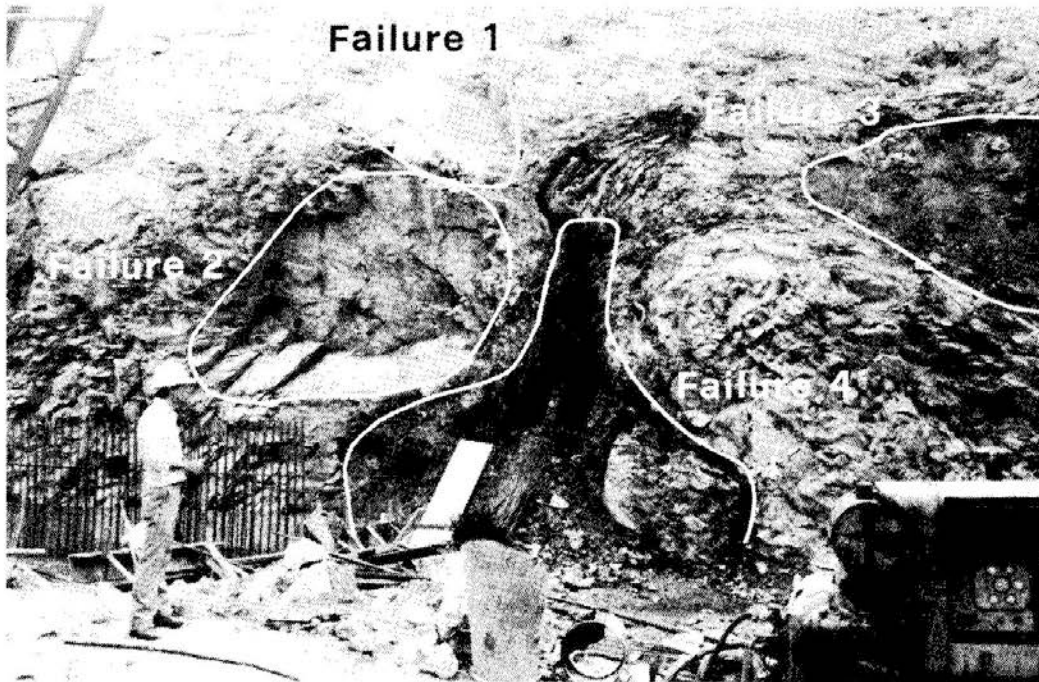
Eastern side of reservoir excavation showing overturned fold in metasandstone and four failures.
